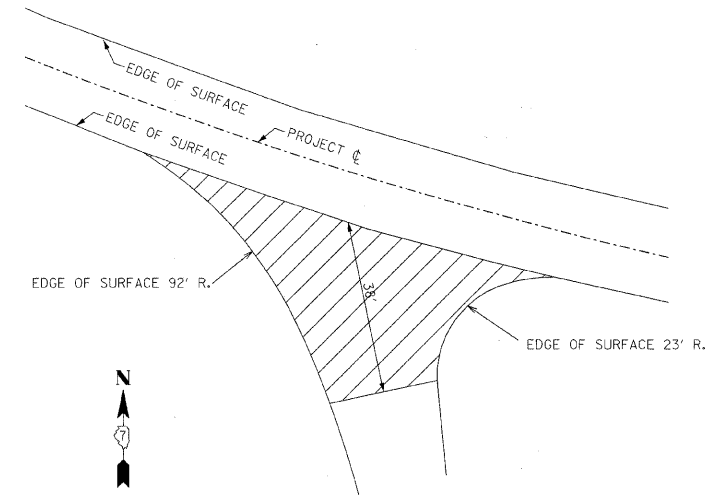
DETAIL OF INTERSECTION 84+40 LT AND 84+87 RT
